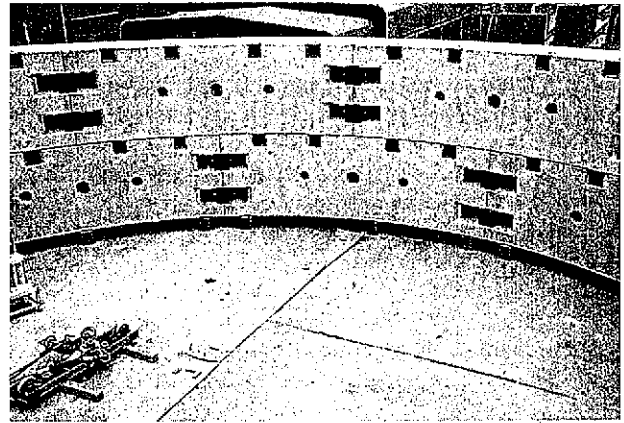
Application example of connection-type high-stiffness joints in underground river tunnel
